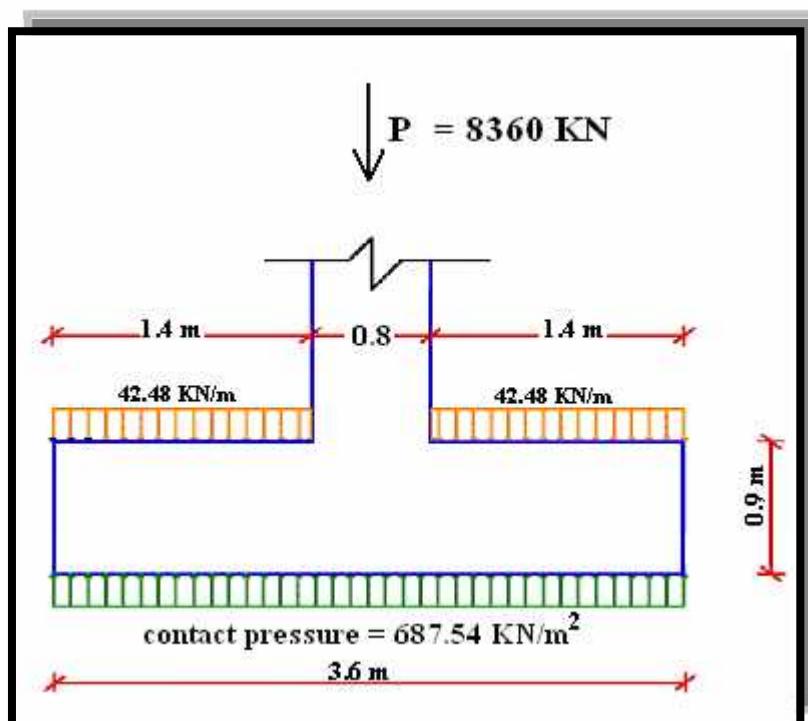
Structural system of Isolating Footing (Section 1-1)
